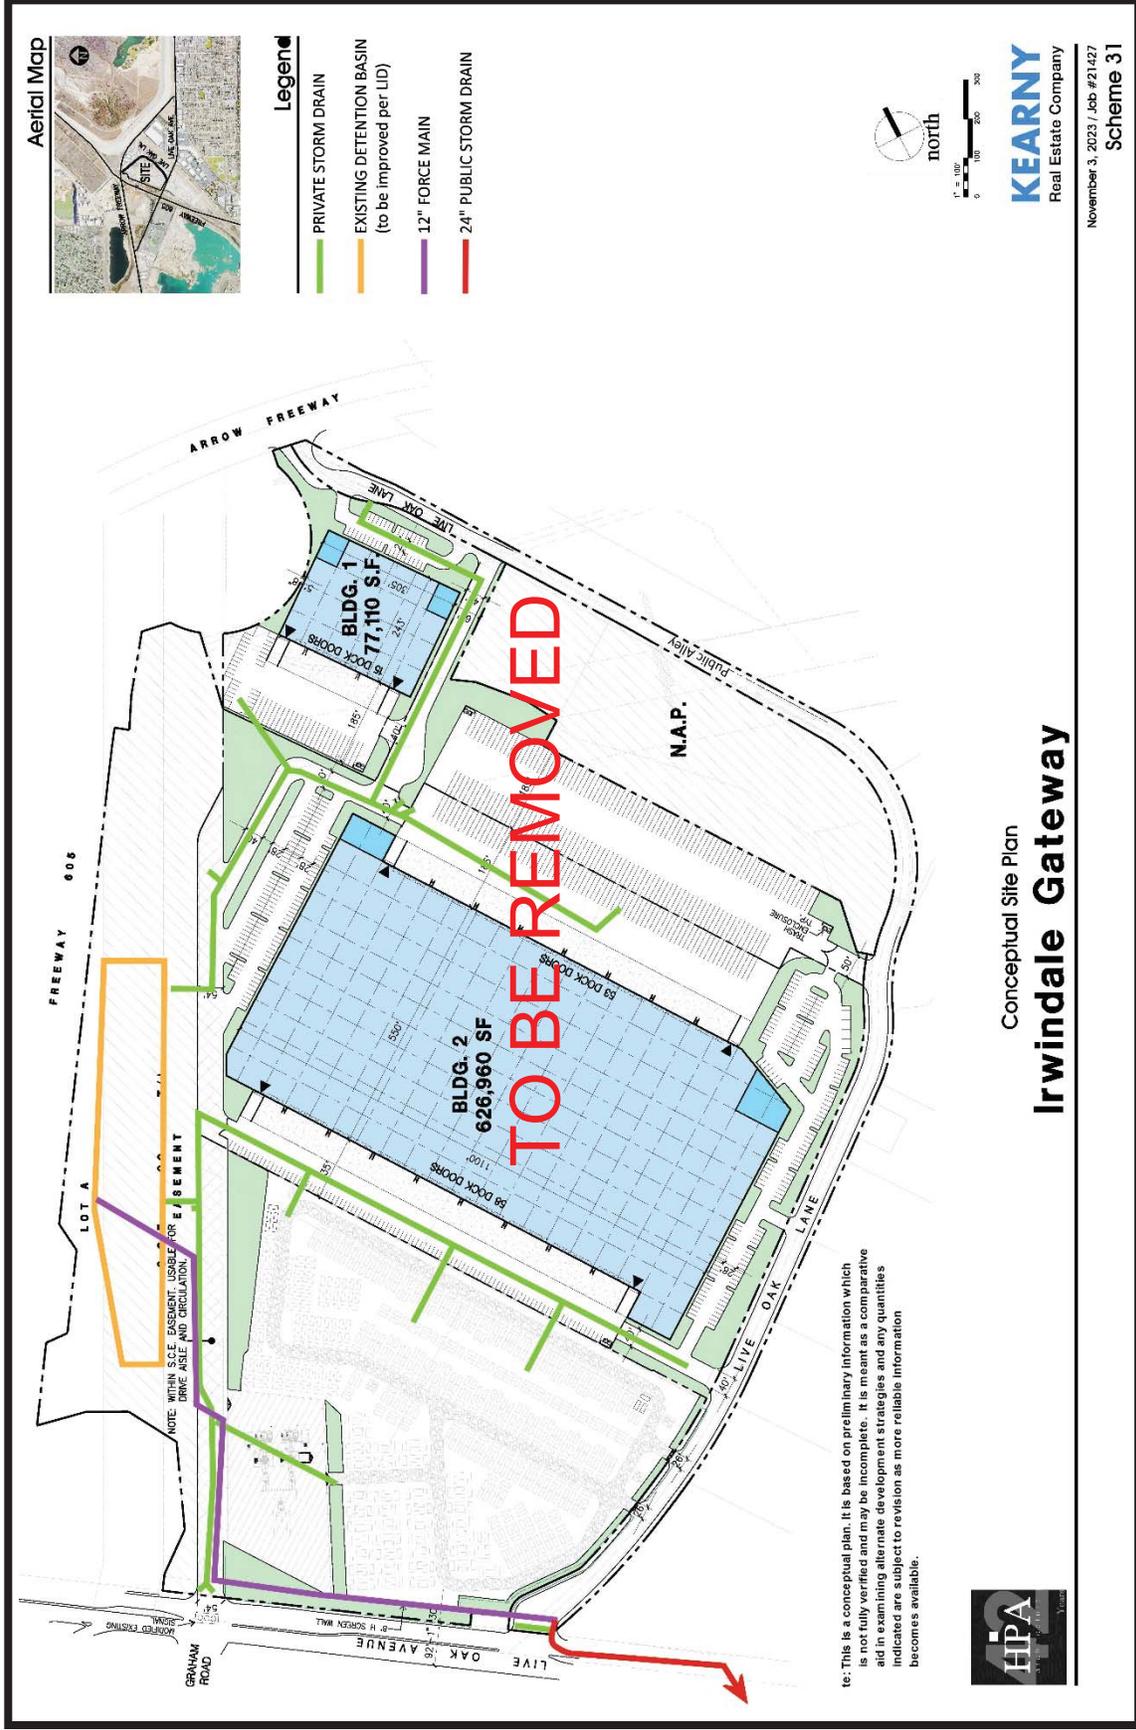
CONCEPTUAL STORM-WATER MANGEMENT PLAN WITH BESS
